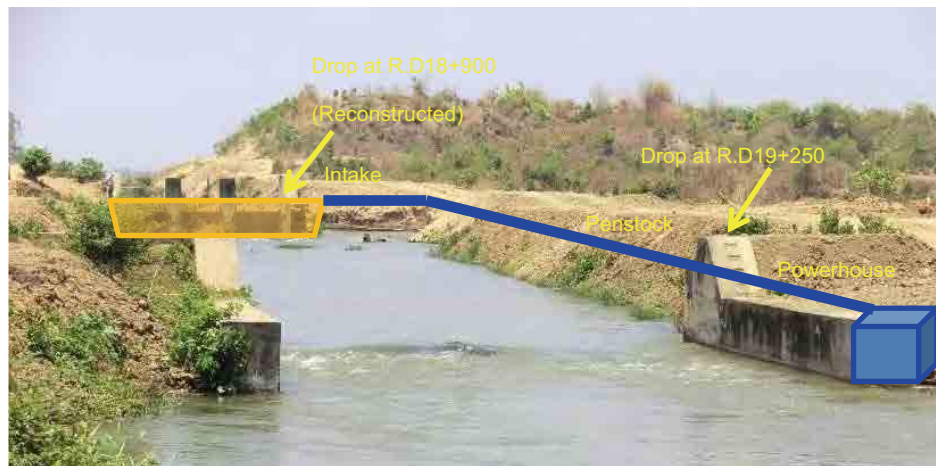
Conceptual Arrangement of Hydropower Plant at Destroyed Drop Structure
